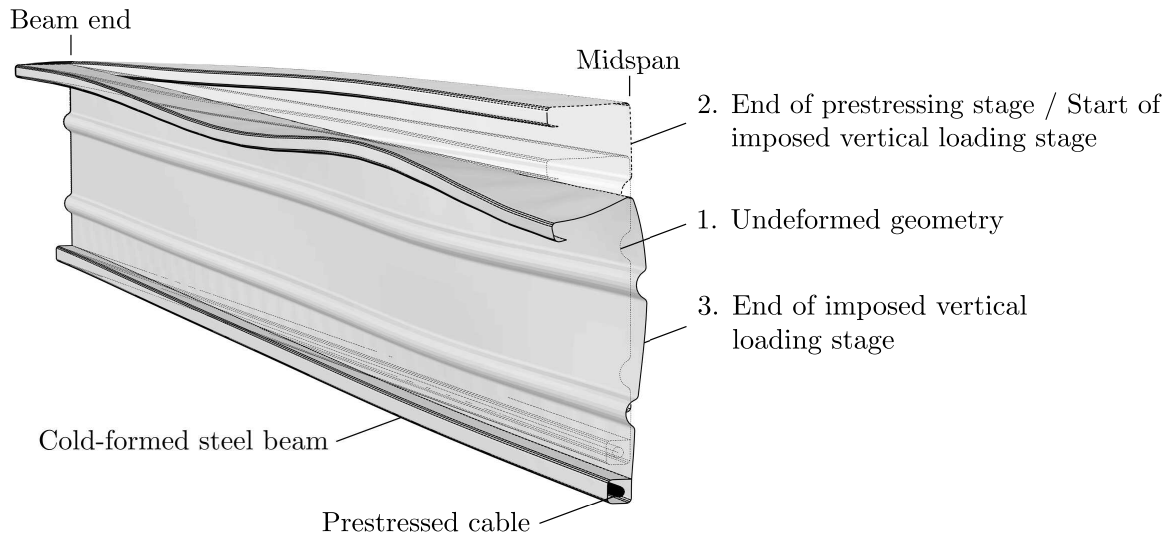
Cross-section cut at the midspan of the prestressed cold-formed steel beam showing the deformed geometry at the start and at the end of the two loading stages.
